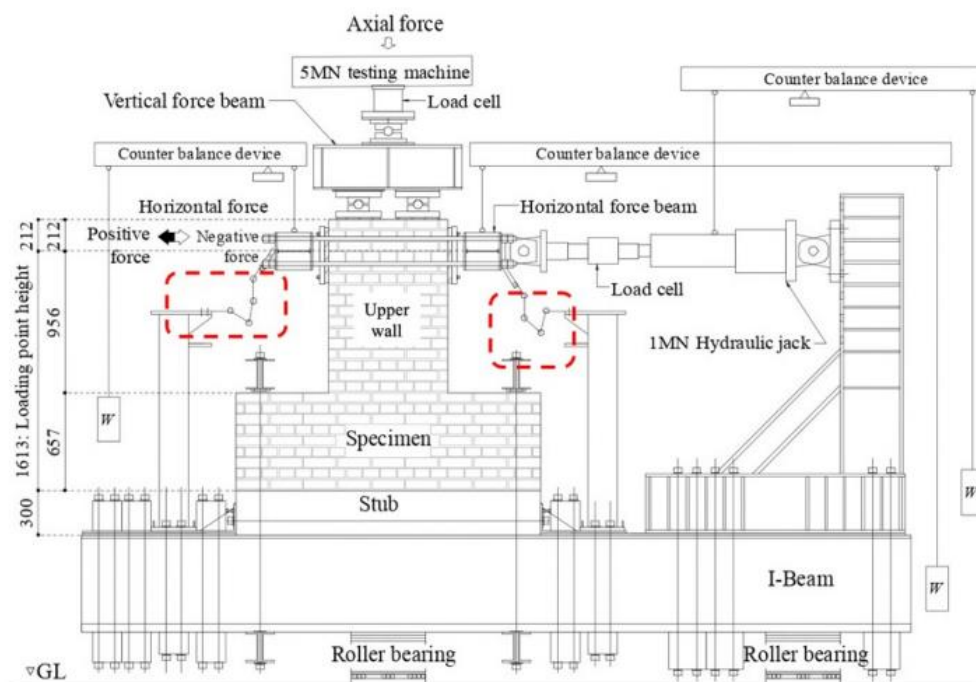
Loading setup for wall specimens (Unit: mm). Out-of-plane twisting constrain device shown in red dotted box
